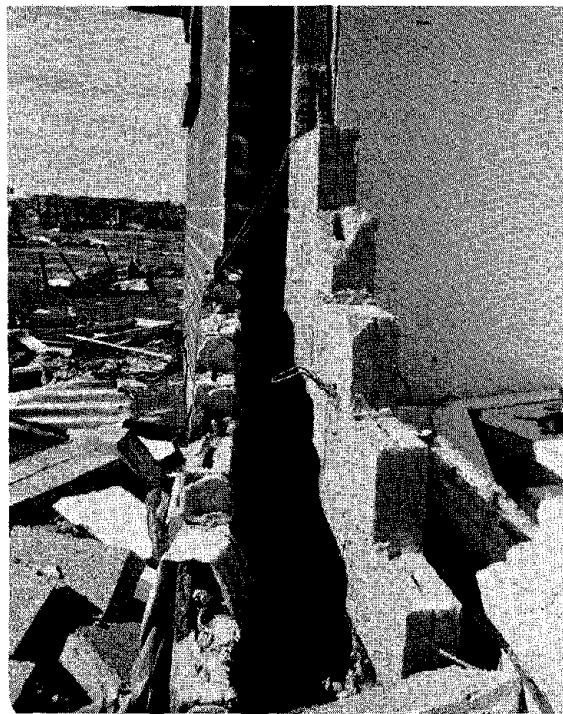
Failure of brick and concrete block cavity wall
